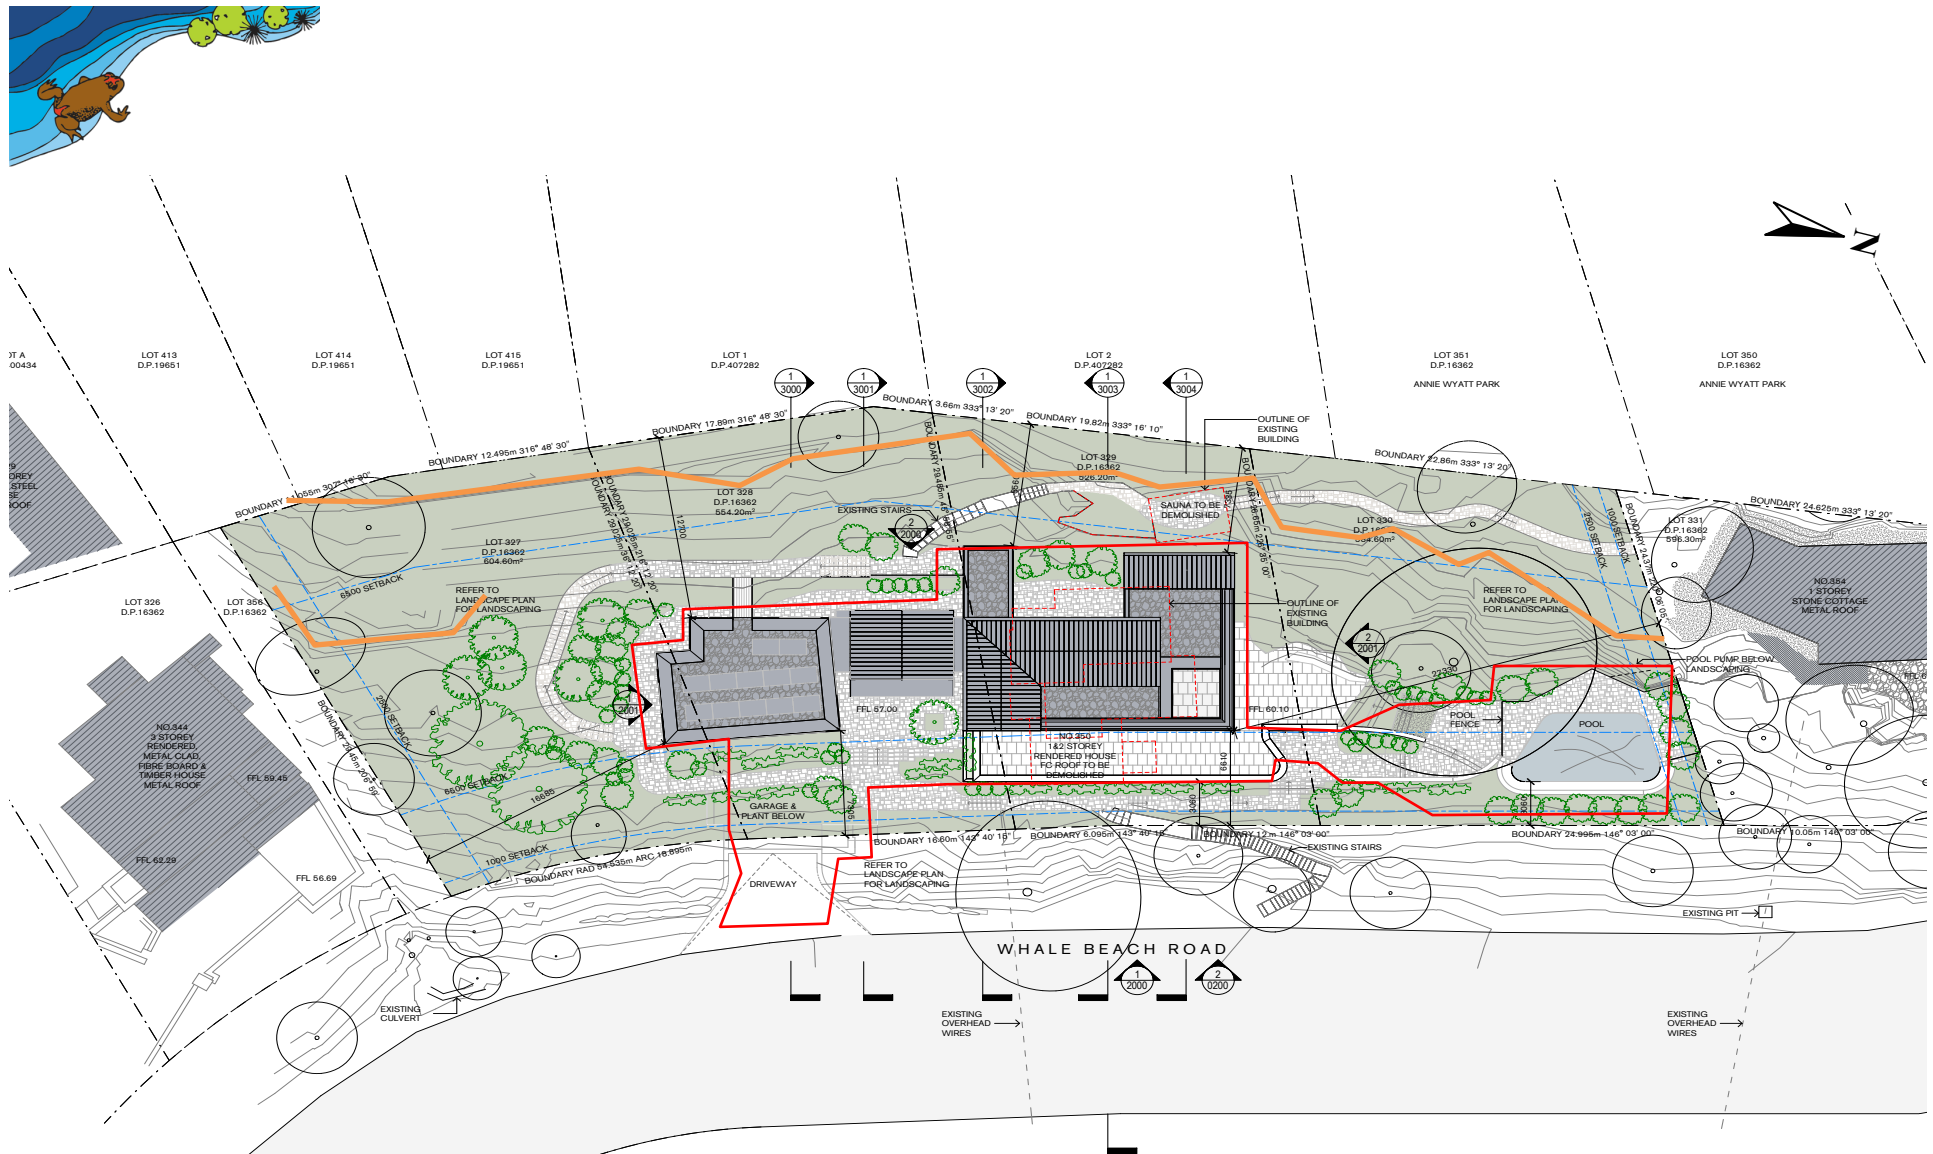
Site Plan (Revision B, 31/1/19). Proposed new residence across Lots 327, 328 and 329, numbers 346-350 Whale Beach Road, Palm Beach. Note that a new gym and swimming pool are proposed for Lot 330. Red line encloses new works. Orange line indicates rock faces.
